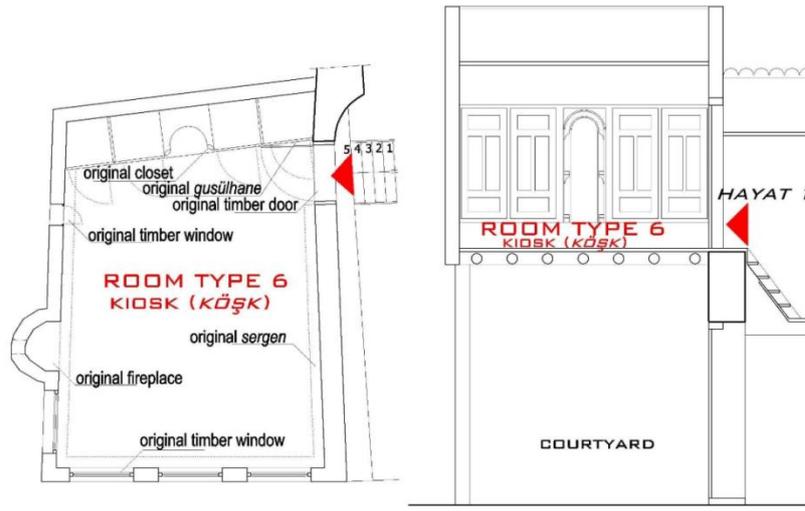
The plan and the section of the Room Type 6, house numbered 152.
